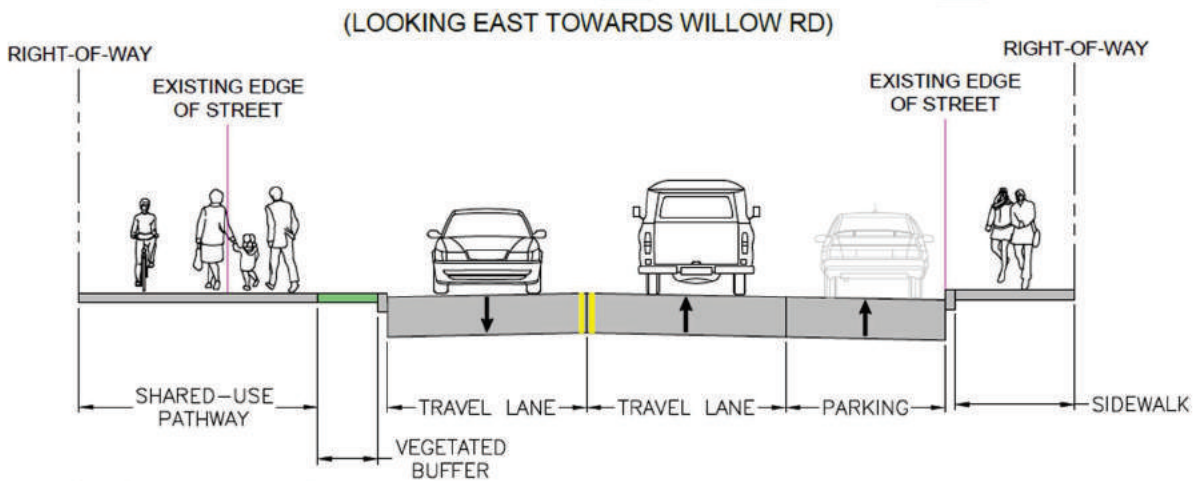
Coleman Avenue (City of Menlo Park) Preferred Long-term Alternative Cross Section Bicycle Boulevard with Shared Use Pathway and Parking on One Side
